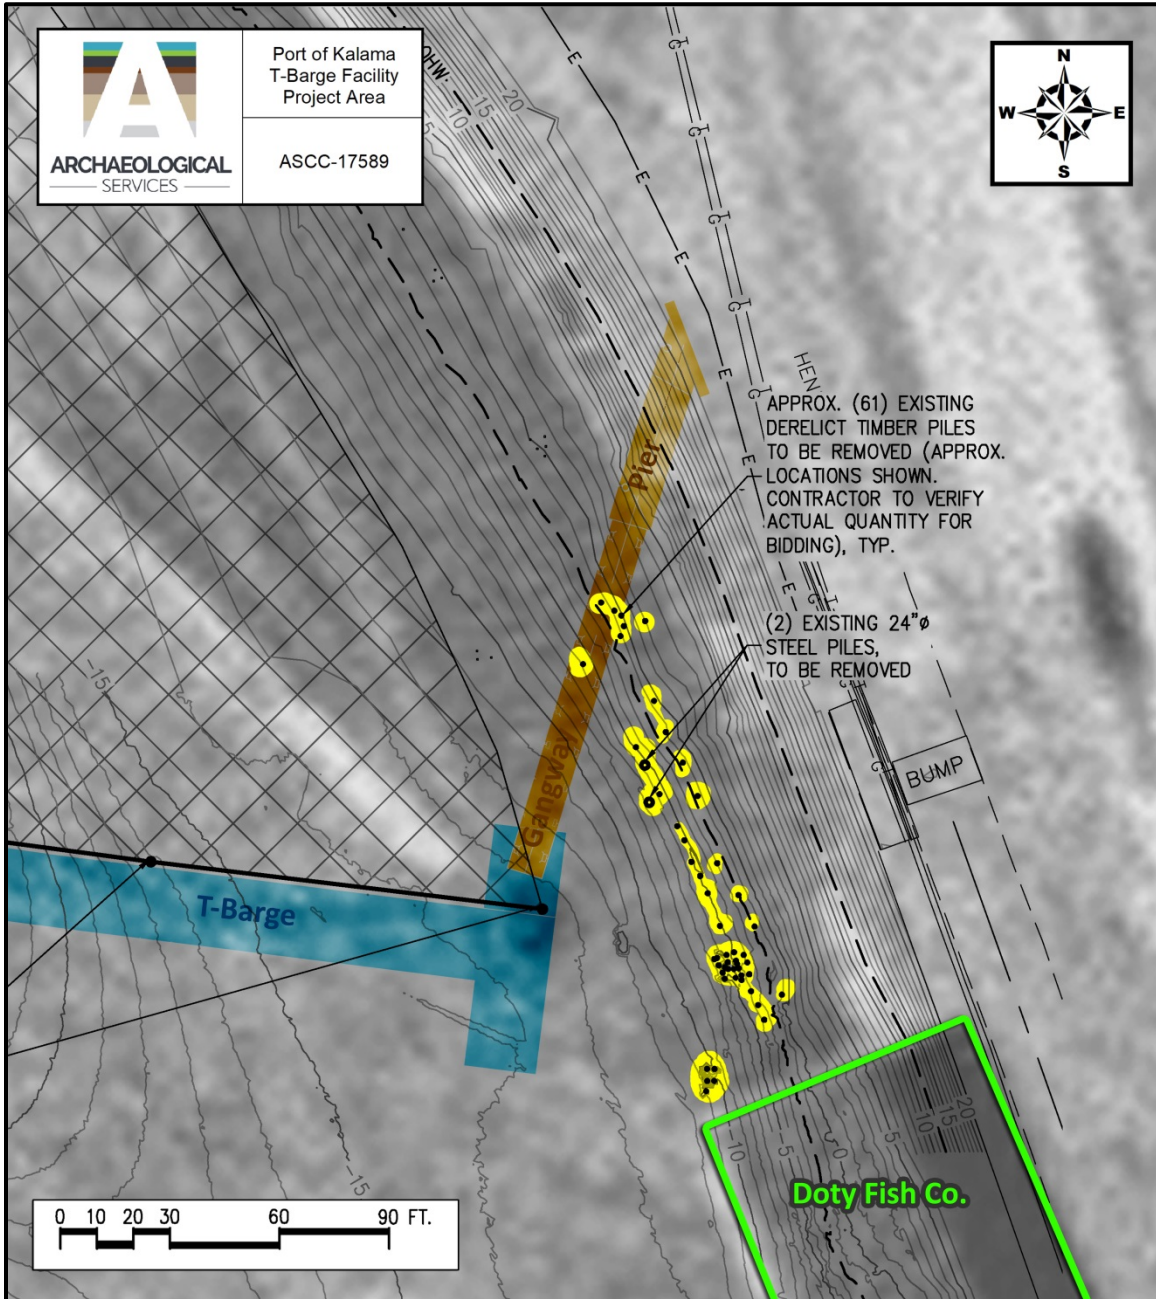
Detail of 1951 aerial photomap of the project area overlaid with the updated pile removal plans. The Doty Fish Company is building outlined in green.
